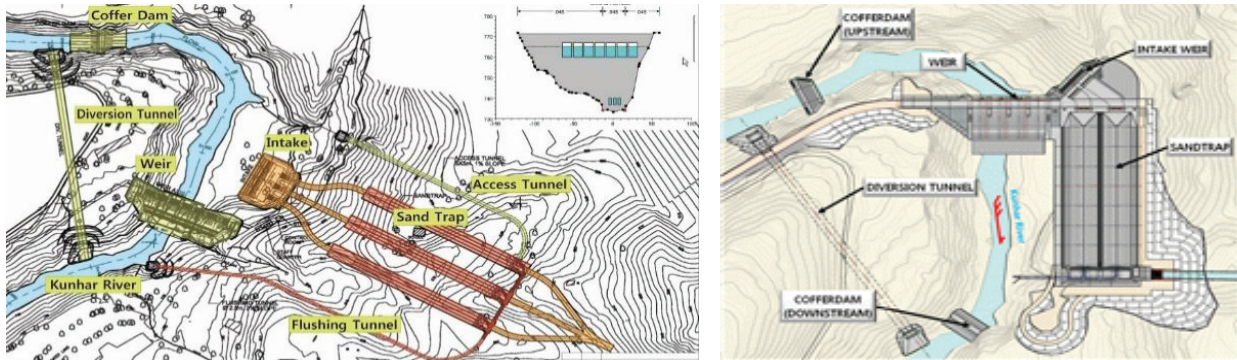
Project Layout of the Feasibility Study(left) and Basic Design (right)
